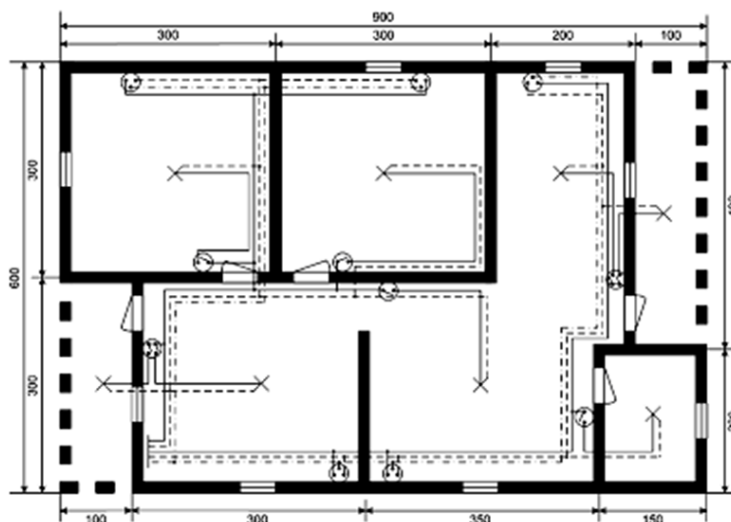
Simple electrical installation for a residential house with a building area of 54 m².
